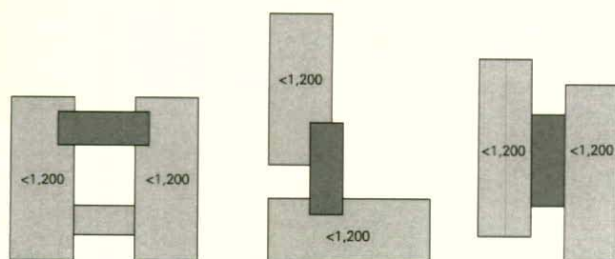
Commercial buildings with large floor plates must be expressed as separate building elements of not more than 1,200 square metres. The horizontal dimensions of any building facade must not exceed 60 metres
